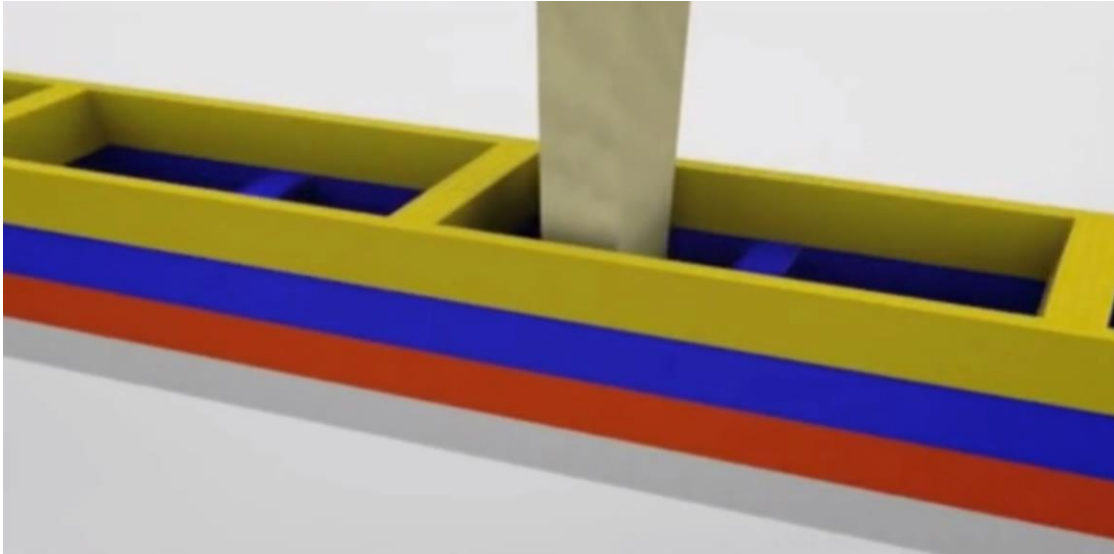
Wooden passive structure inside the original LEGO® House (1)
